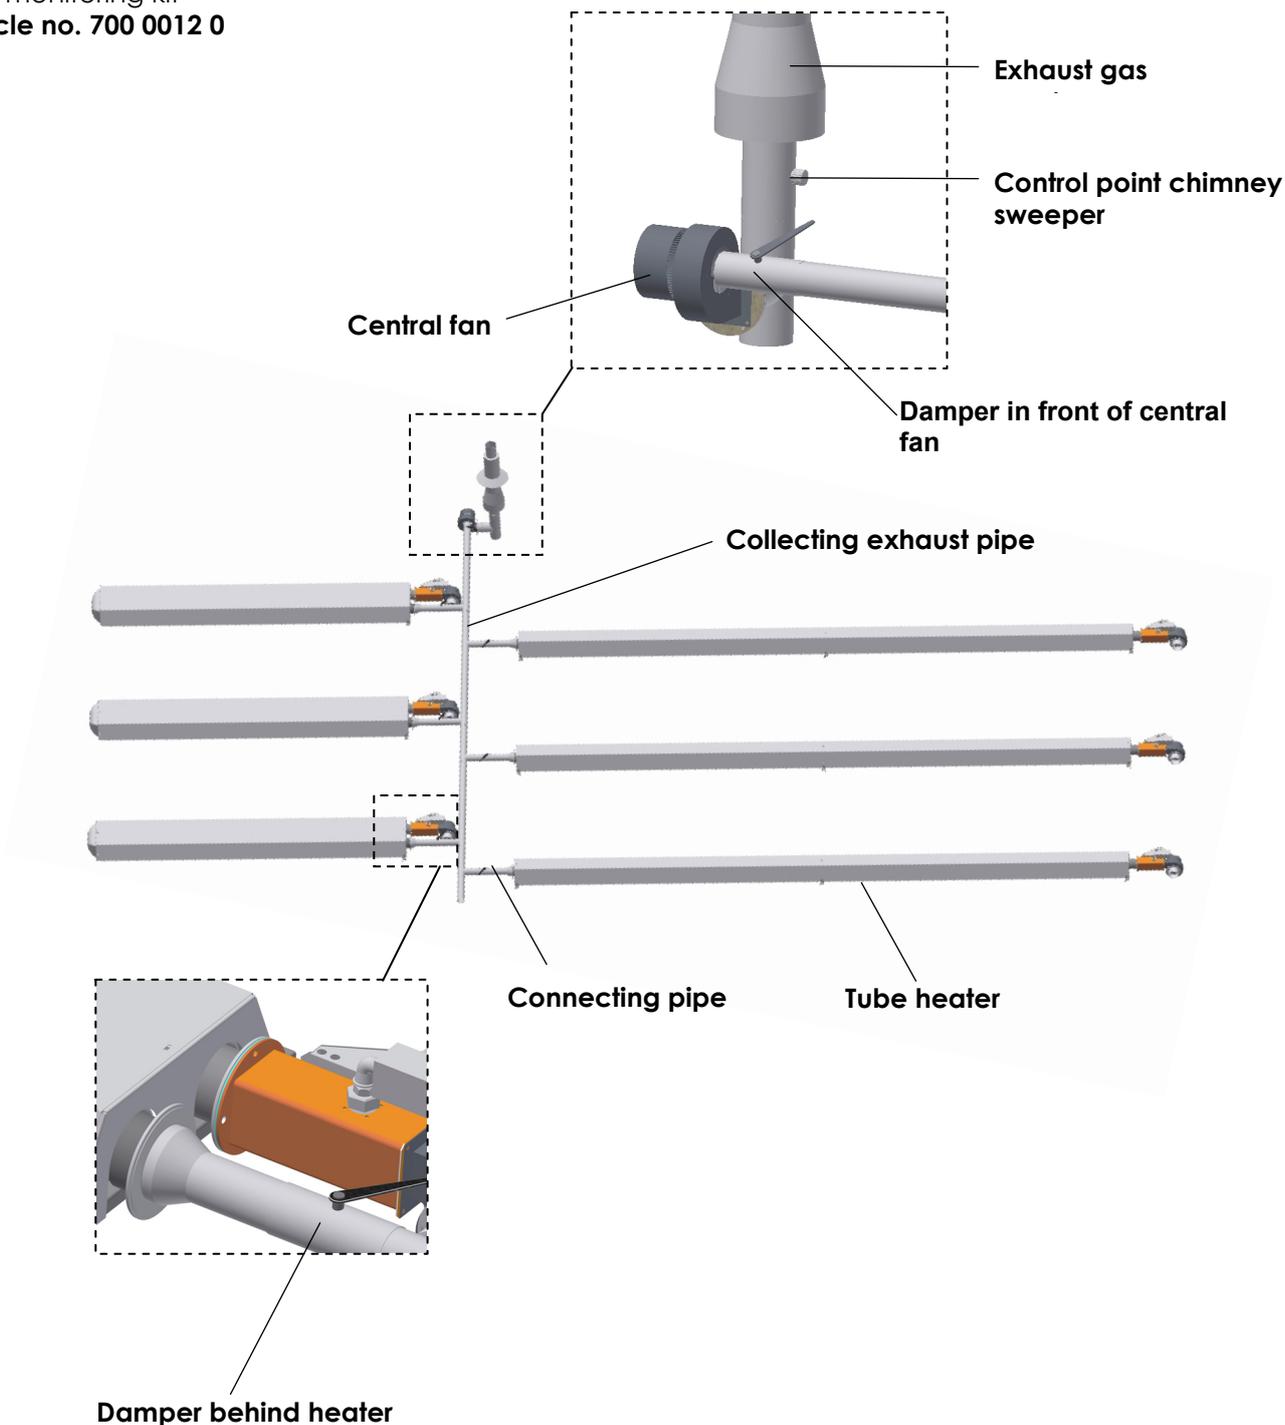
Installation exhaust collecting system with central fan , system F [principle scheme]
